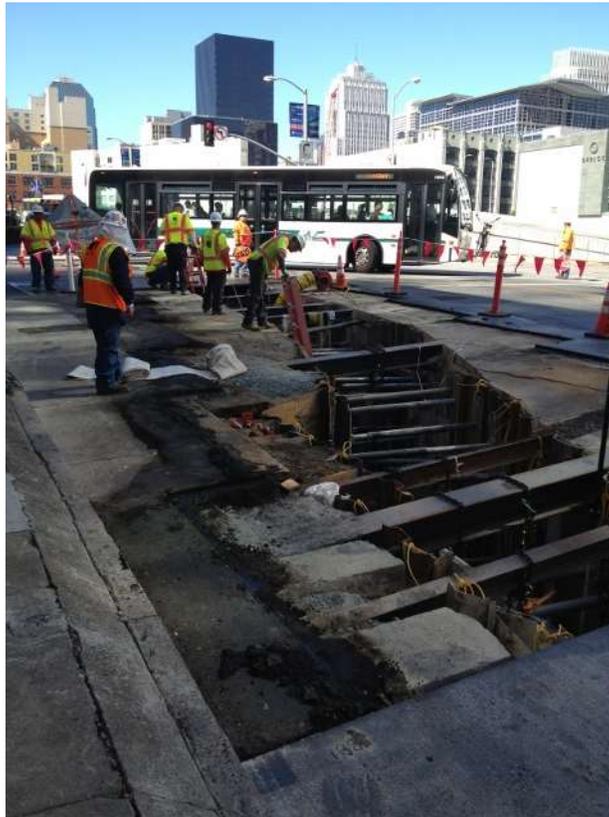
Preparing to pour concrete on Folsom Street between Fremont and Beale Streets. View southwest, September 8, 2015.
